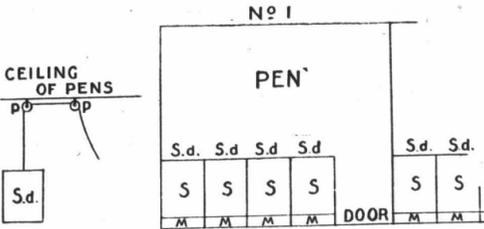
FIG. I. PLAN OF CALF BOX WITH SINGLE STALLS.
